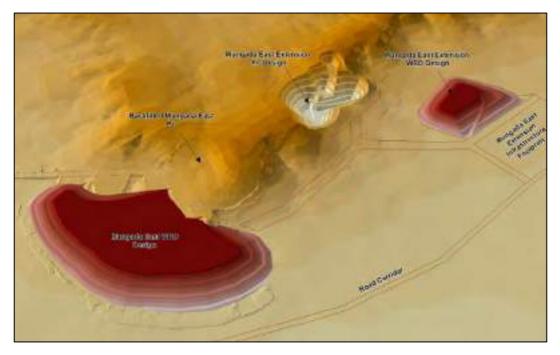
Conceptual layout of the Proposal showing proposed backfilling of the existing Mungada East pit
